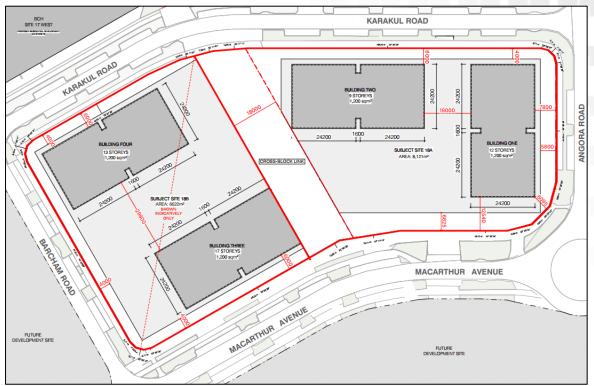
Site plan showing proposed lots, volumetric easement and built form on Site 18A (eastern proposed lot) and indicative built form for Site 18B (western proposed lot)
